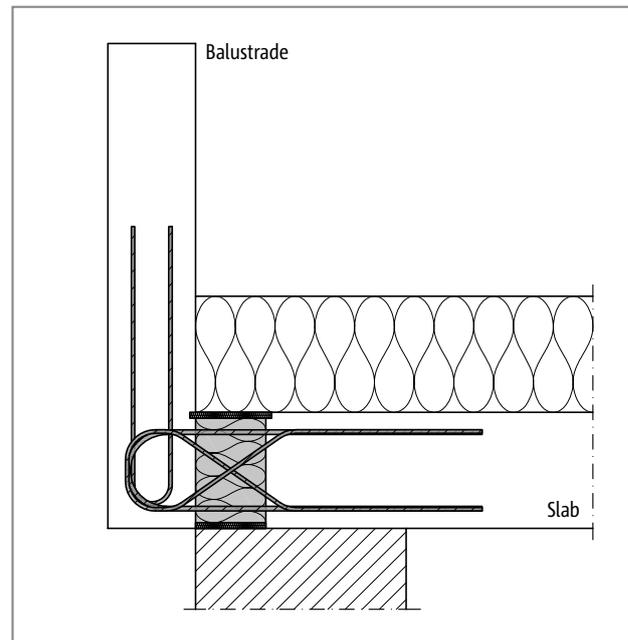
Schöck Isokorb® XT type F: Connection of a frontally attached balustrade with thermal insulating masonry
